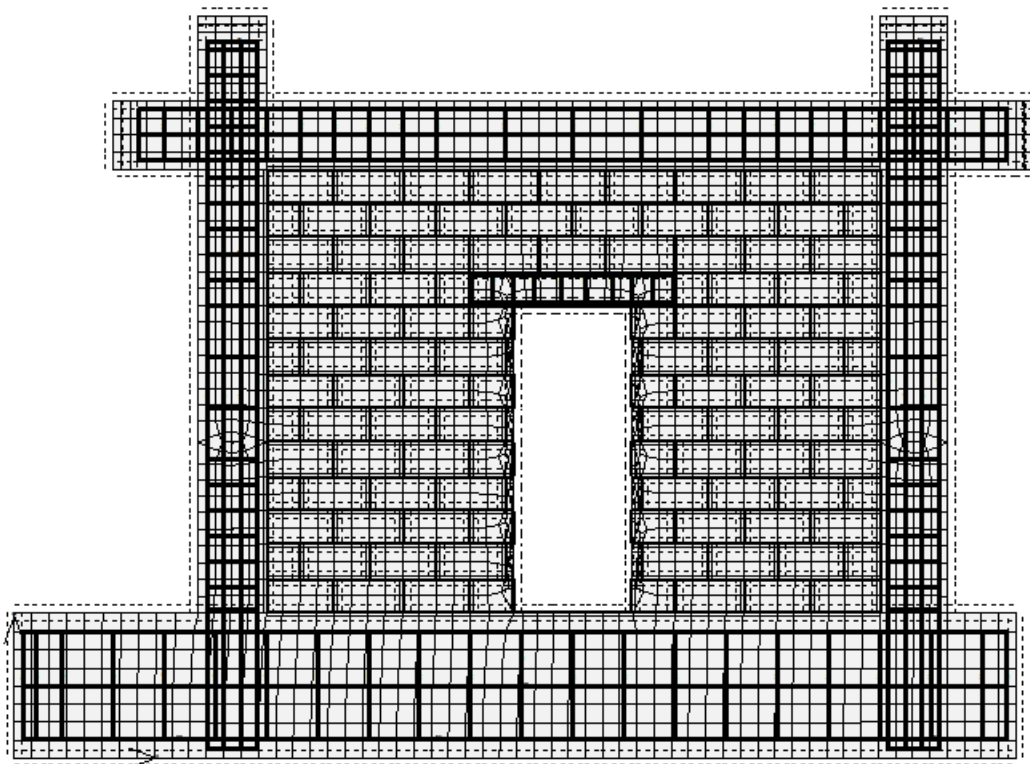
Typical masonry infilled reinforced concrete frame developed in ATENA 2D Eng (Cervenka Consulting s.r.o. 2015).
